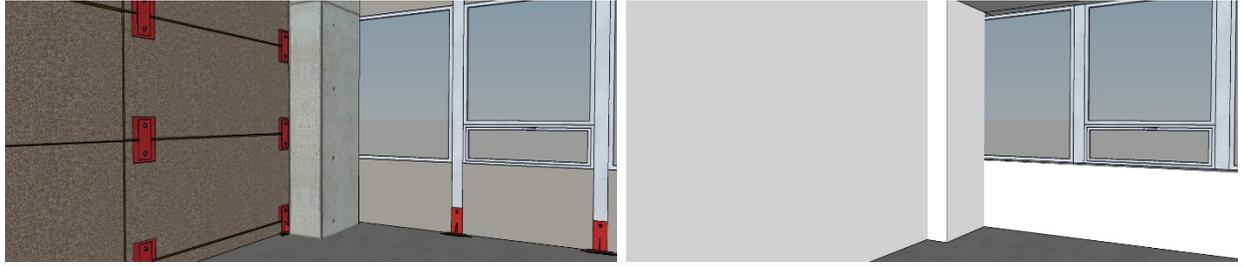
Curtain Wall Details (left - exposed, right with typical guest room finishes in place)
